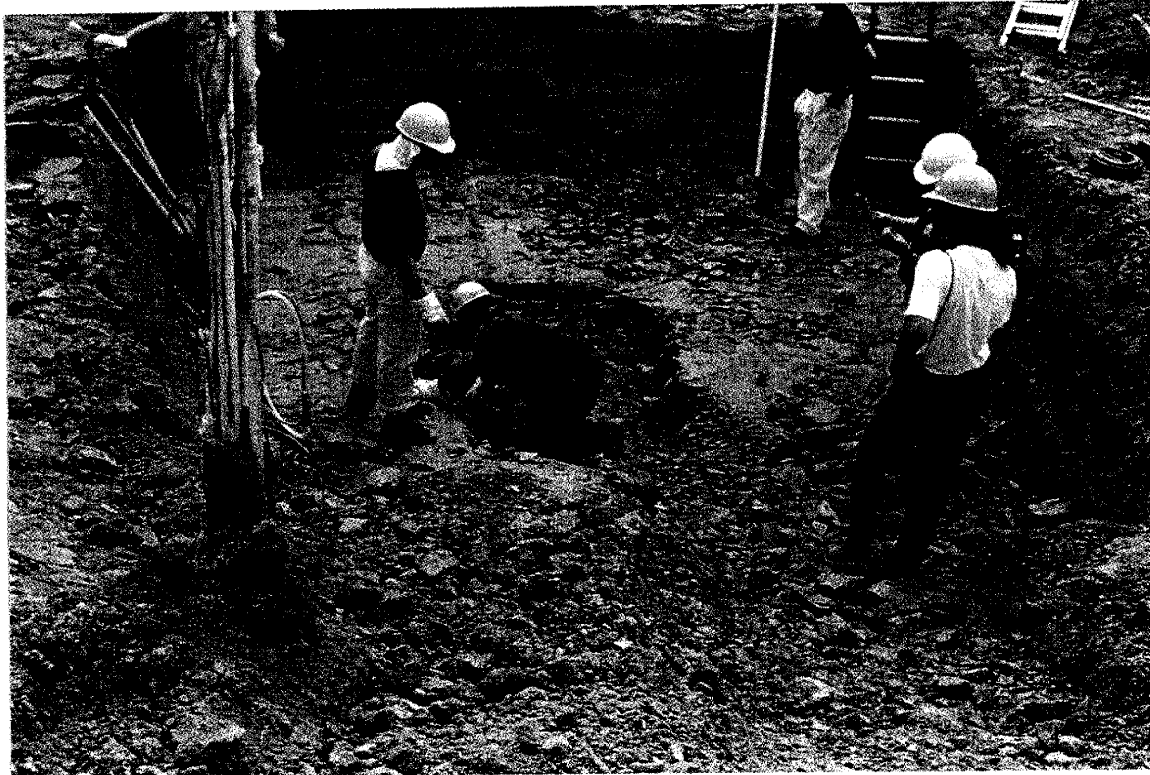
Hand excavation into the unoxidized, layered clays of Unit 2. The PVC tubing and cables of both an upper and lower sampling point are visible to the left. Note the bentonite seal at the base.
